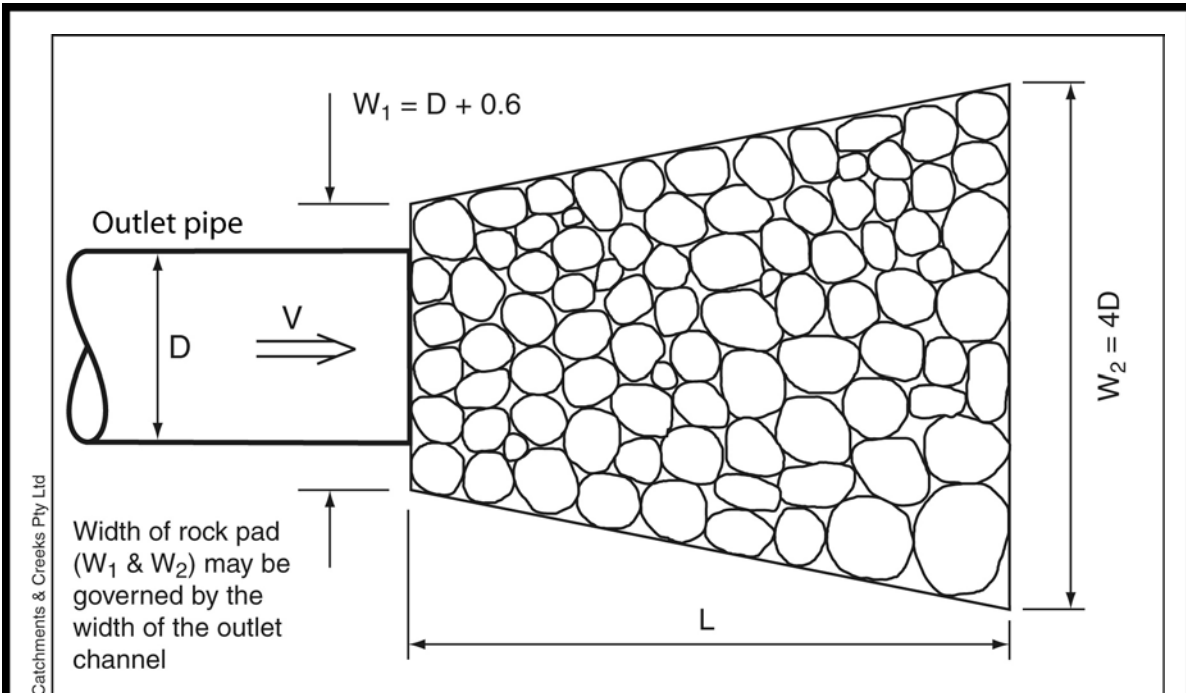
Typical layout of a rock pad for a slope drain outlet (plan view)
